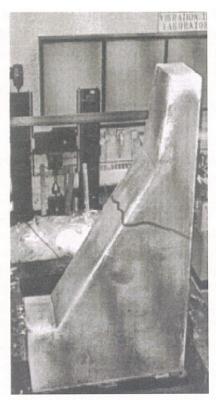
Konya model with shrinkage crack mounted on shake table.
